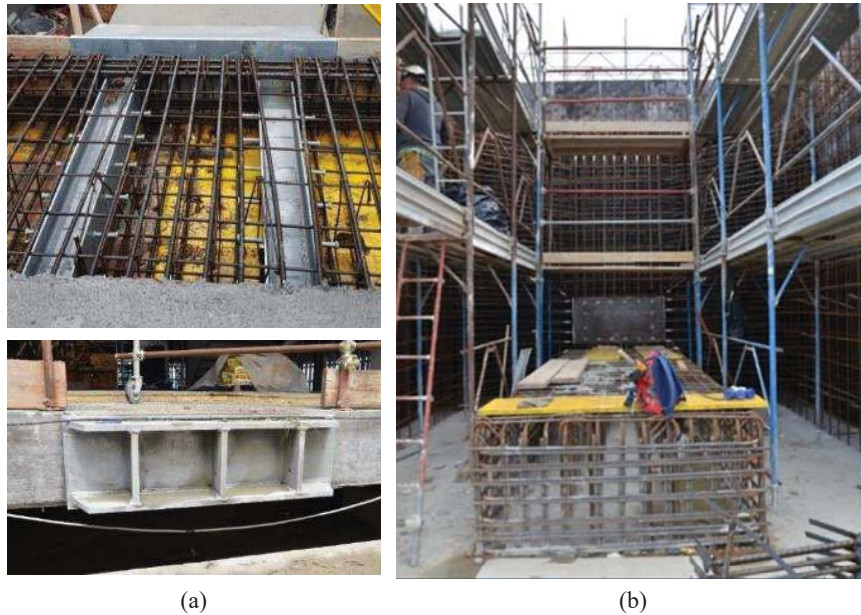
Reinforcement details of the building tall beam (a) and the reaction walls (b).
